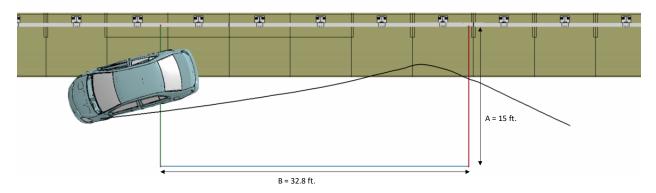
Exit box for Test 4-10 for sidewalk-mounted system.
